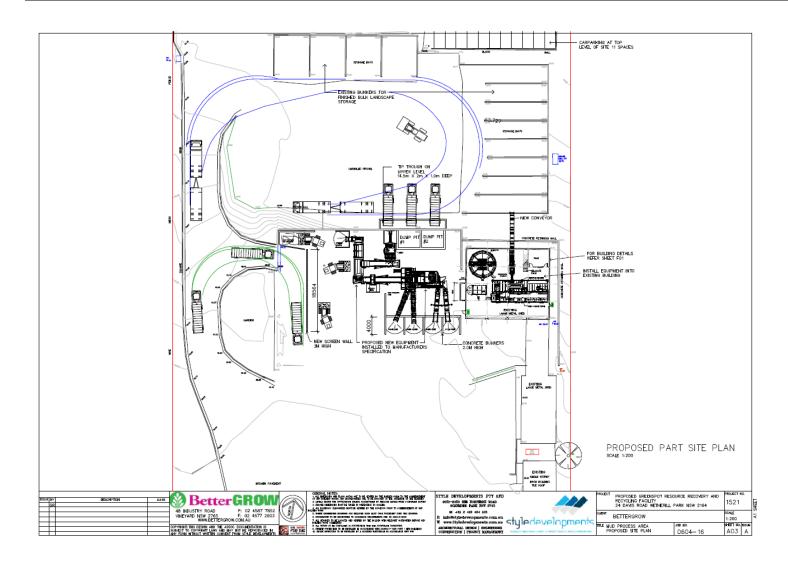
Site Layout - Drill Mud and Hydro-excavation Area
